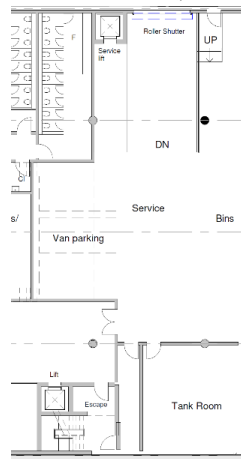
Ground Floor Plan Indicating Service Area Housing Waste Storage\
